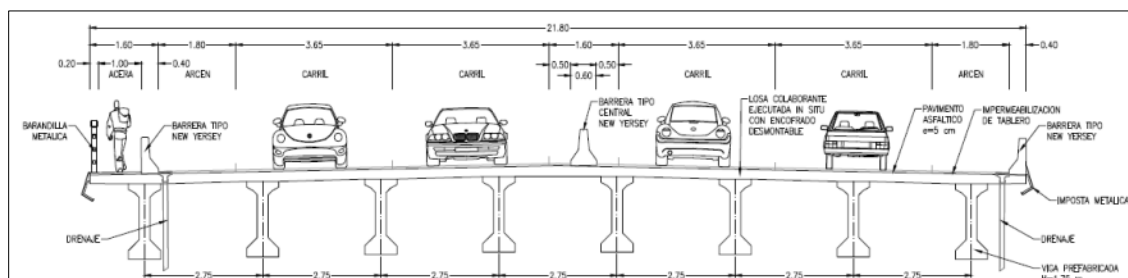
Elevation of the El Tablón Alto Bridge.
